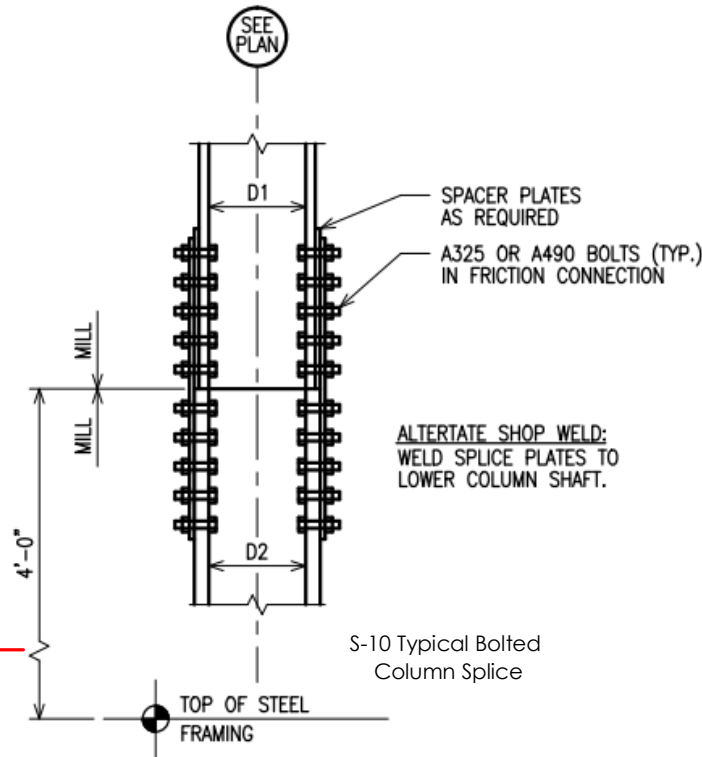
Details the typical spliced connection at the third floor level where column sizes are reduced.
